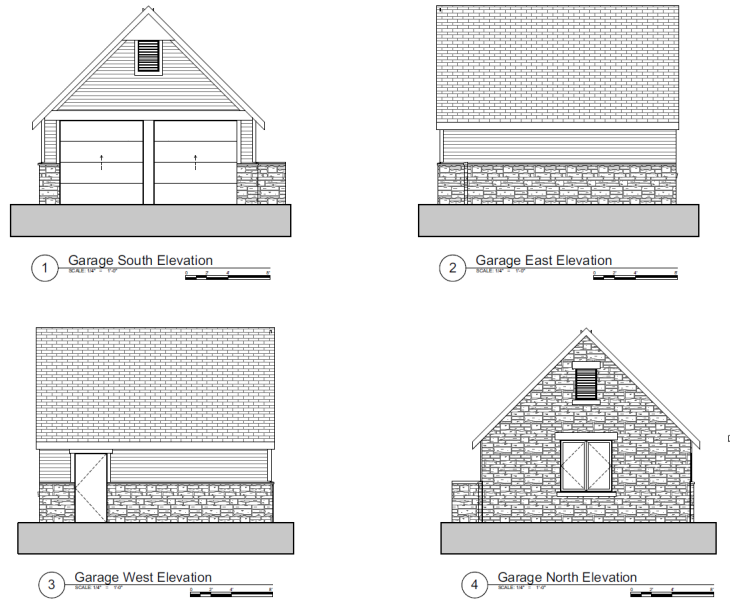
Proposed Garage: (clockwise from top left) South (alley), east, north (yard) and west (side) elevations. Not to scale.
